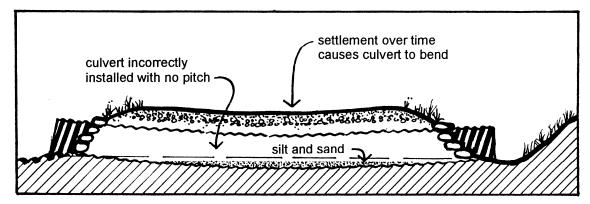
Incorrect way to set a culvert: center too low; silt freezes and plugs culvert.
